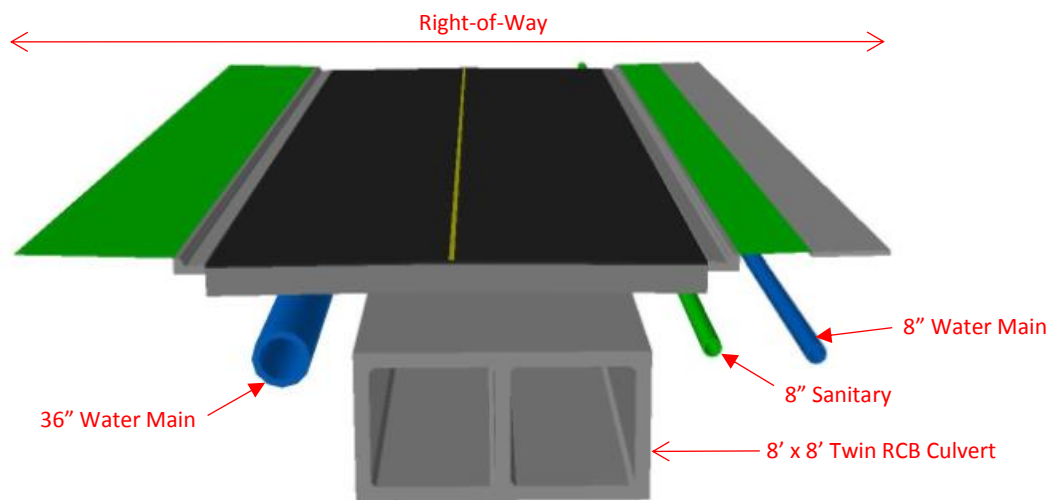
3D Rendering of Rome Avenue north of Gray Street Typical Section (NTS)
